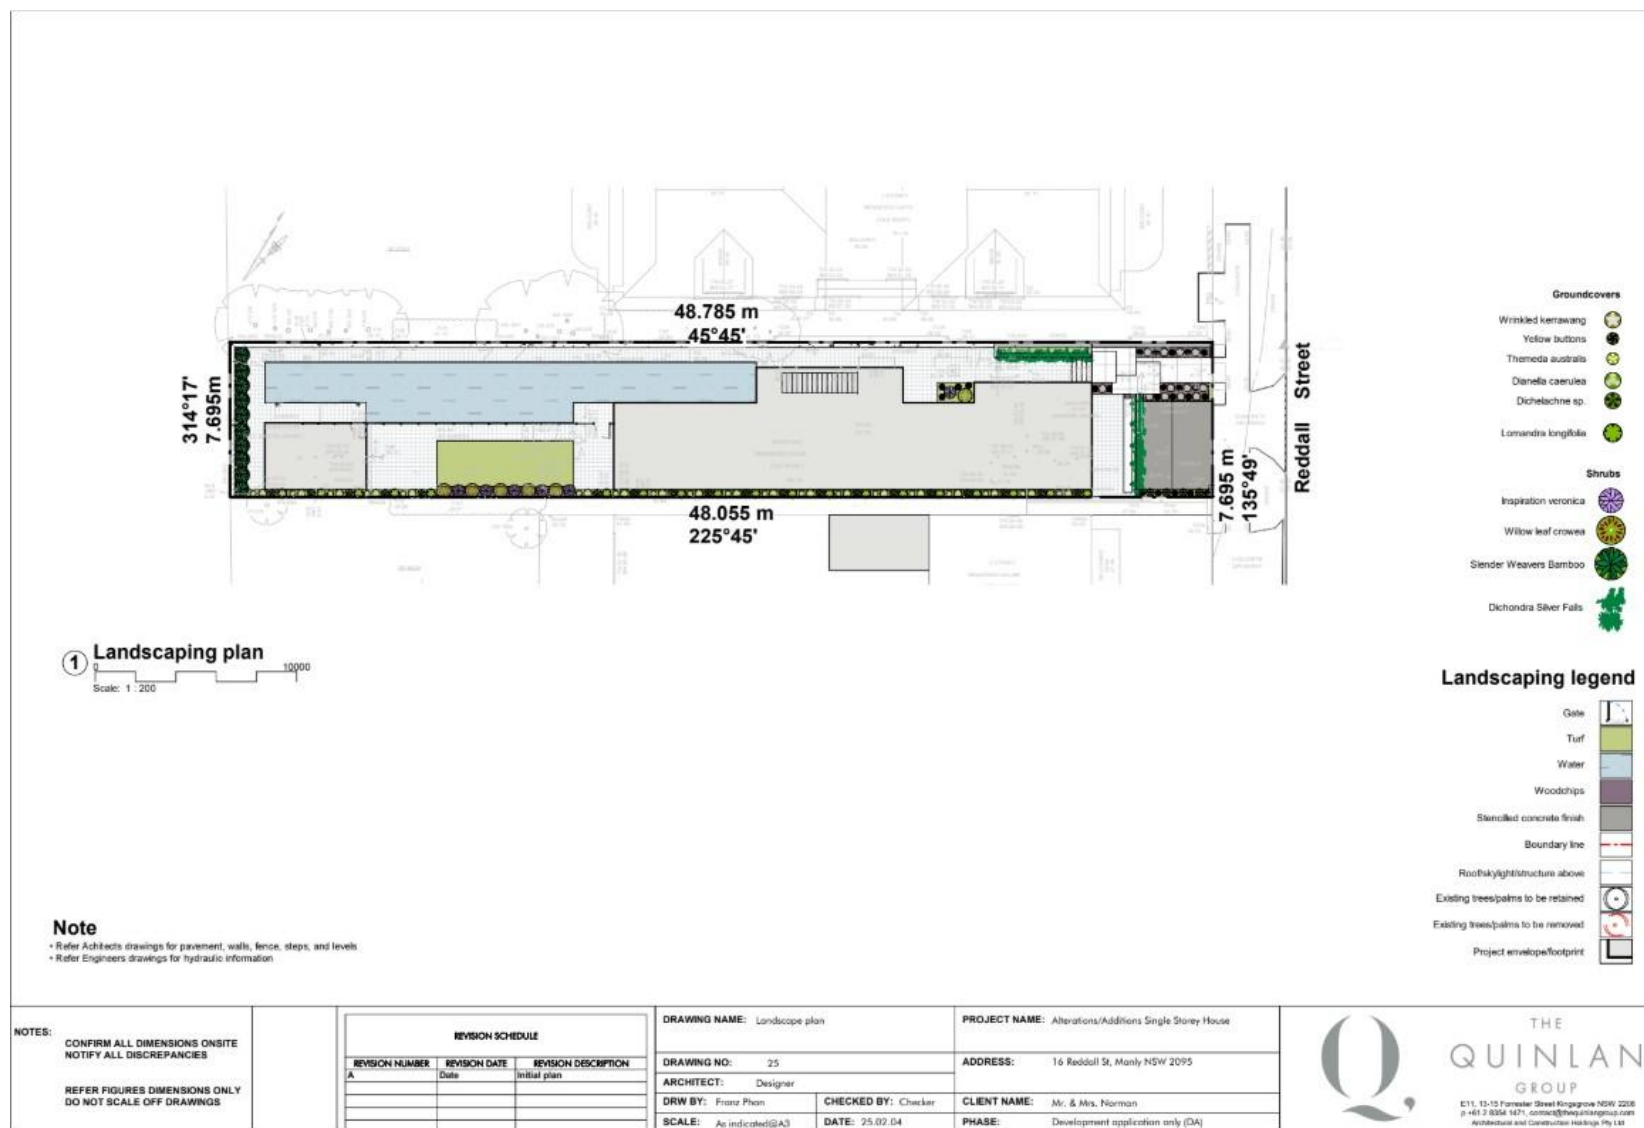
Proposed Landscape Plan (The Quinlan Group 2025)
